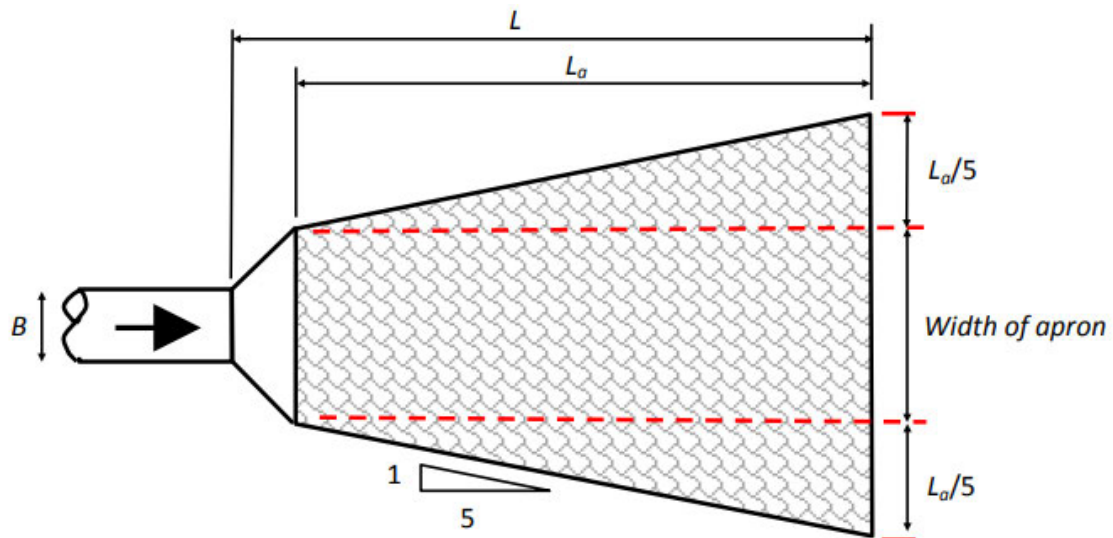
Rock apron geometry for a single pipe outlet (Austroads 2013).
